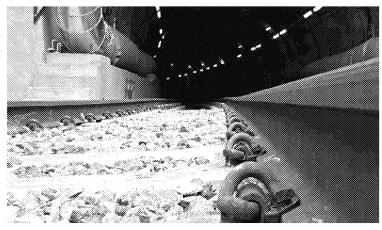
(top): westbound low rail looking towards the tunnel mouth at 100km 408m
